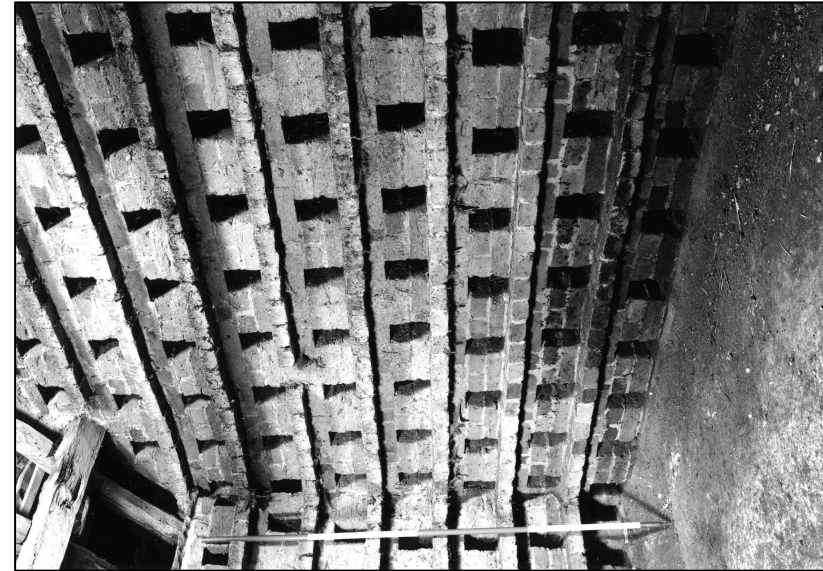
Granary: 2F pigeon loft, typical arrangement of upper row of boxes to E and W walls, looking NW (photo 4/4) (top to left).
